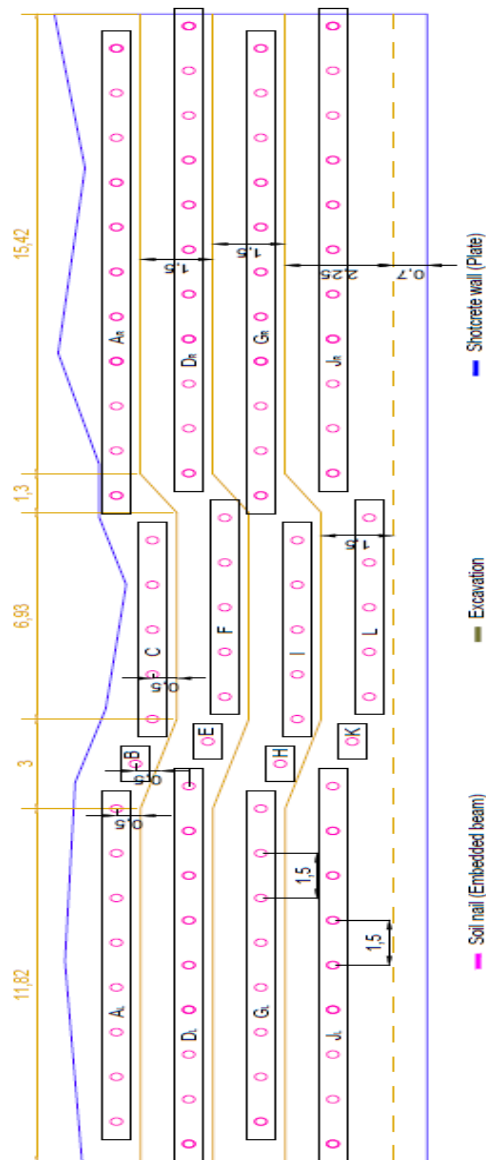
Front view of the soil nail wall (all four rows and three subrows per row)
